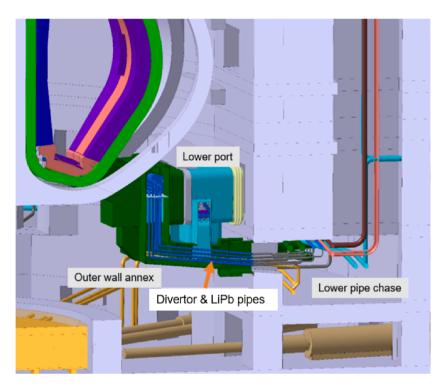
Pipe routing through outer wall annex to lower pipe chase.
